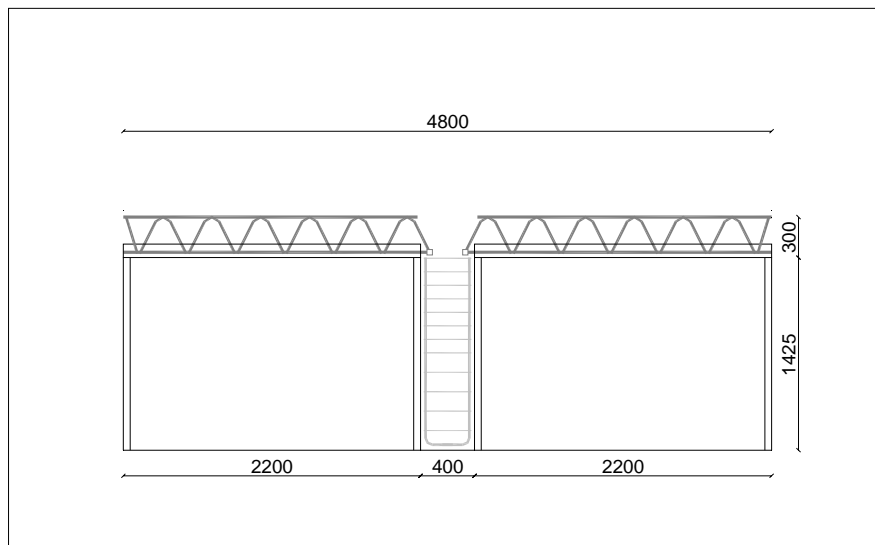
CSTC beam trusses positioning before the lower column concrete cast
